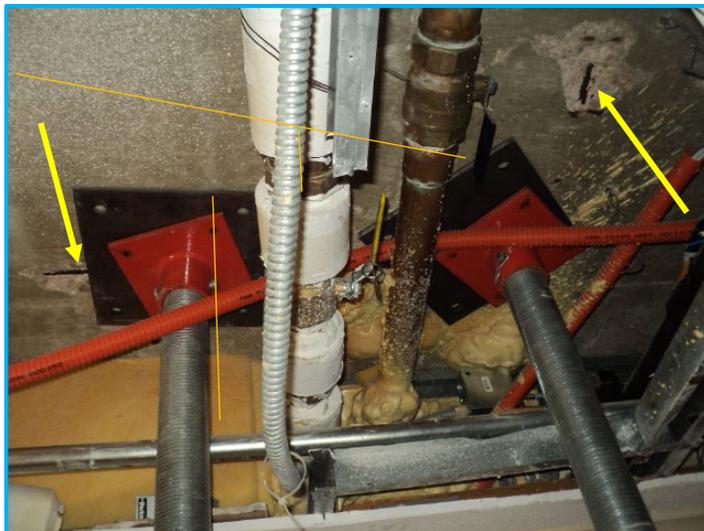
Spalls at concrete roof deck soffit outside of Unit 1501 with slight to moderate rebar corrosion
